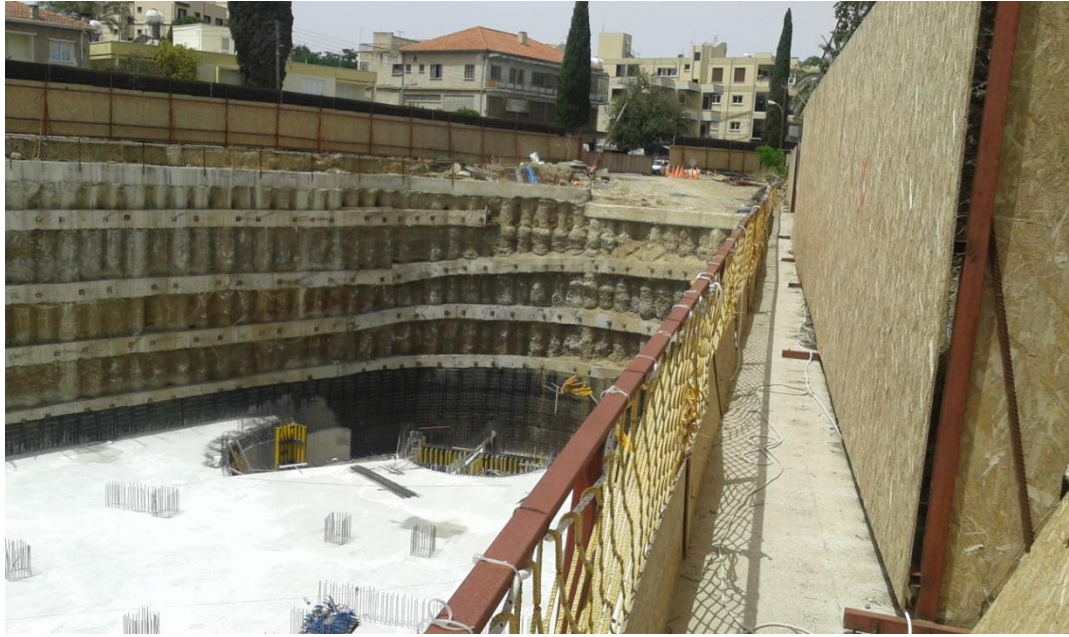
A view of piles, anchorages, moisture isolation on pile-wall, shoring, and partial construction of main structure on 5/12/16
